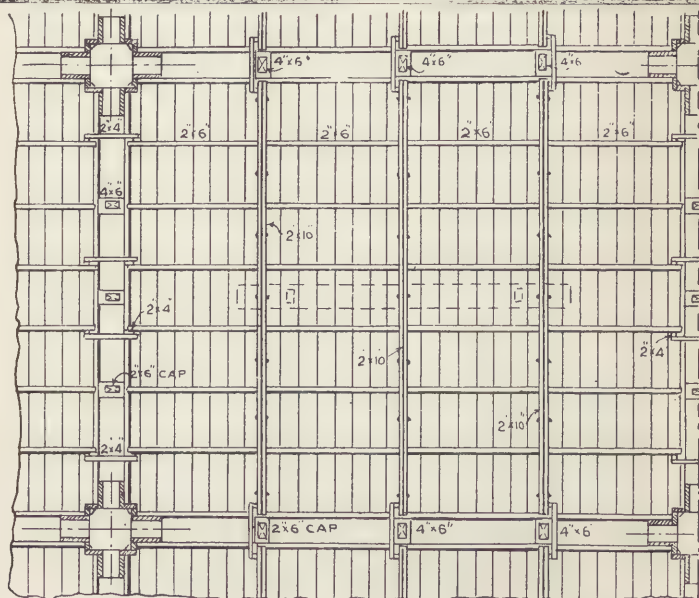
Column, Beam, and Floor Moulds (Plan).
